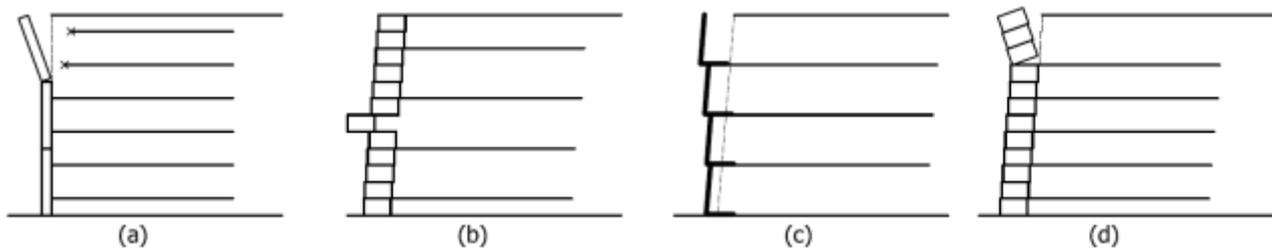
Examples of limit states for local stability at the face: (a) connection rupture, (b) shear failure between face elements (bulging), (c) shear failure between face elements and reinforcements, and (d) toppling of top facing elements not connected to reinforcements
